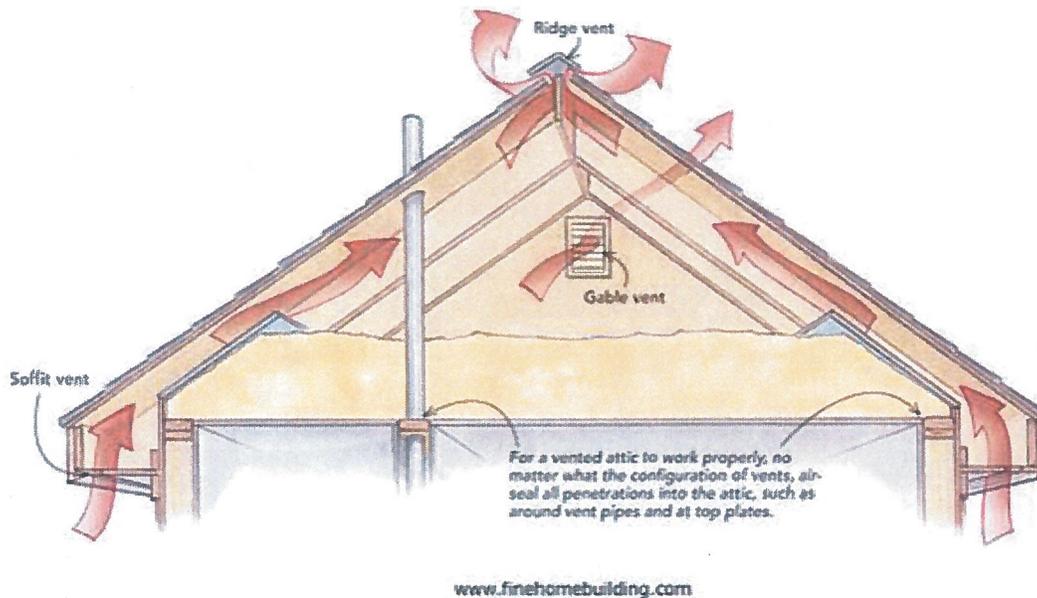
A schematic of vents used to ventilate an attic space from www.finehomebuilding.com. It is common to have at least one outlet vent type, for example gable, ridge or soffit.
